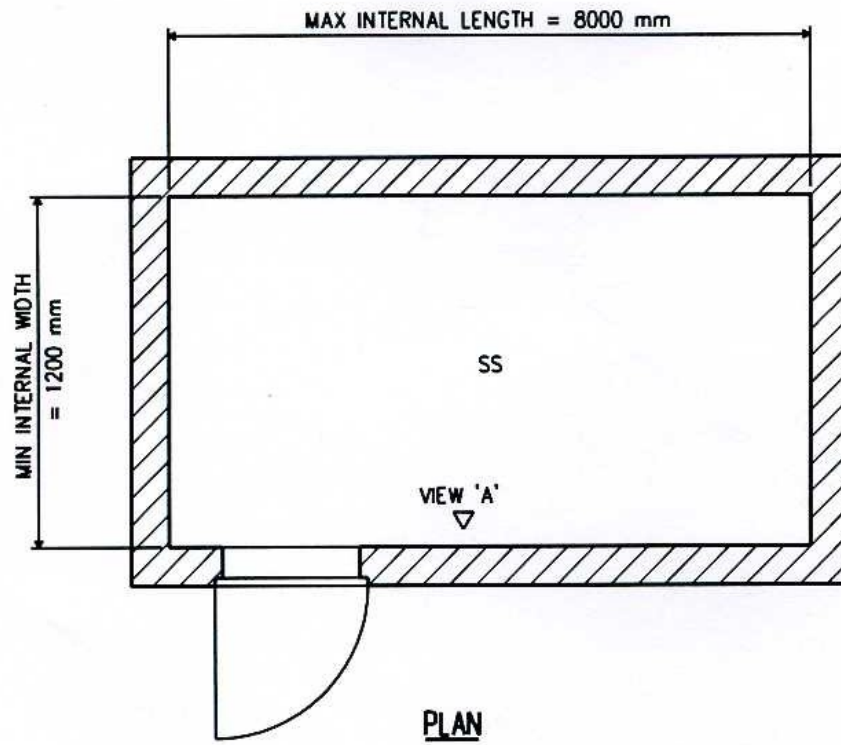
TYPICAL LAYOUT OF SS
